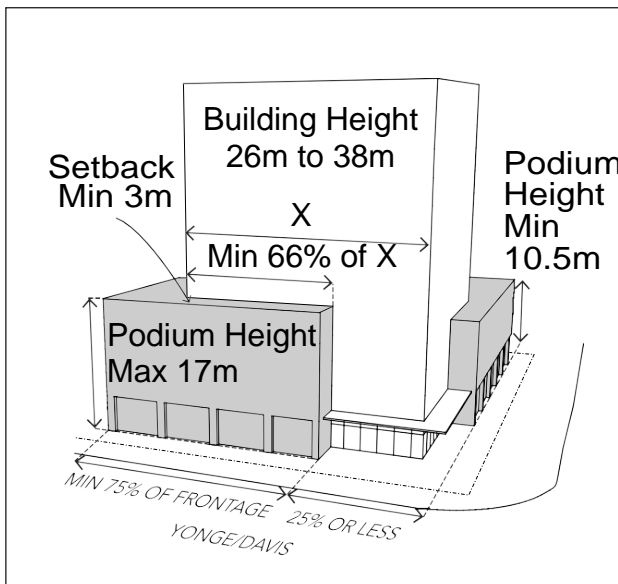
Podium Street Frontage, Minimum and Maximum Height and Setback for Buildings greater than 26 metres but less than 38 metres.
